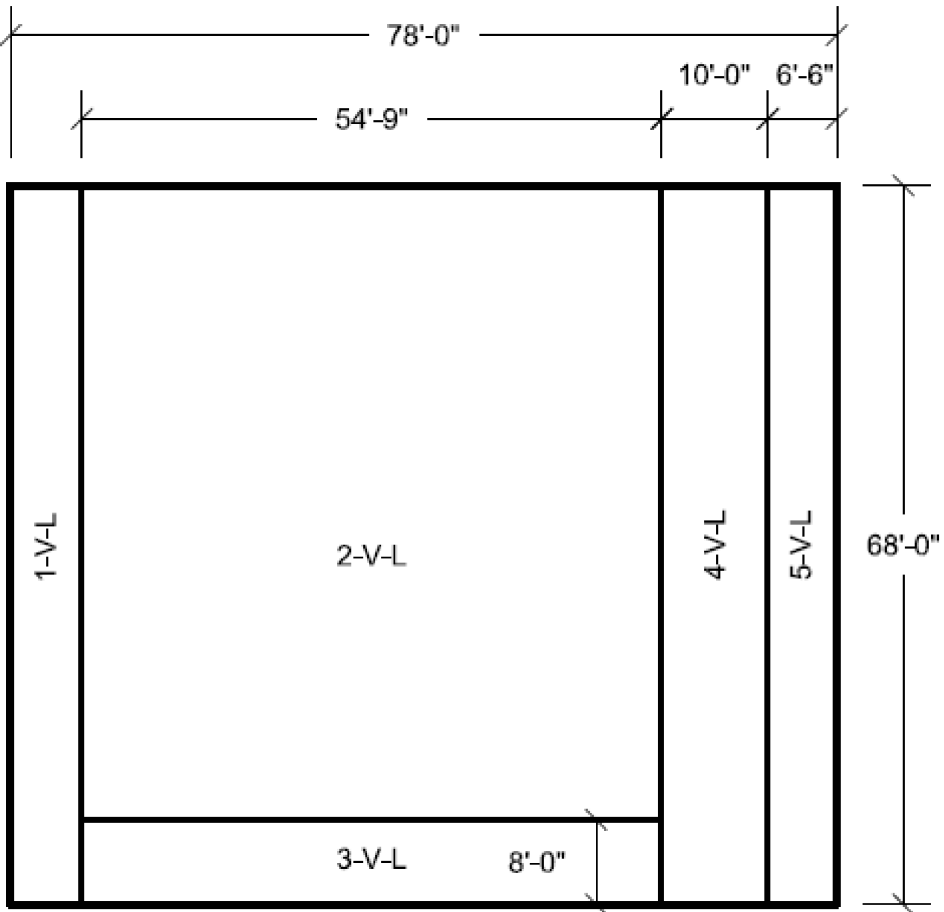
H.6-67 Pump House West Wall Looking East Vertical Reinforcement Zones Near Side Face
